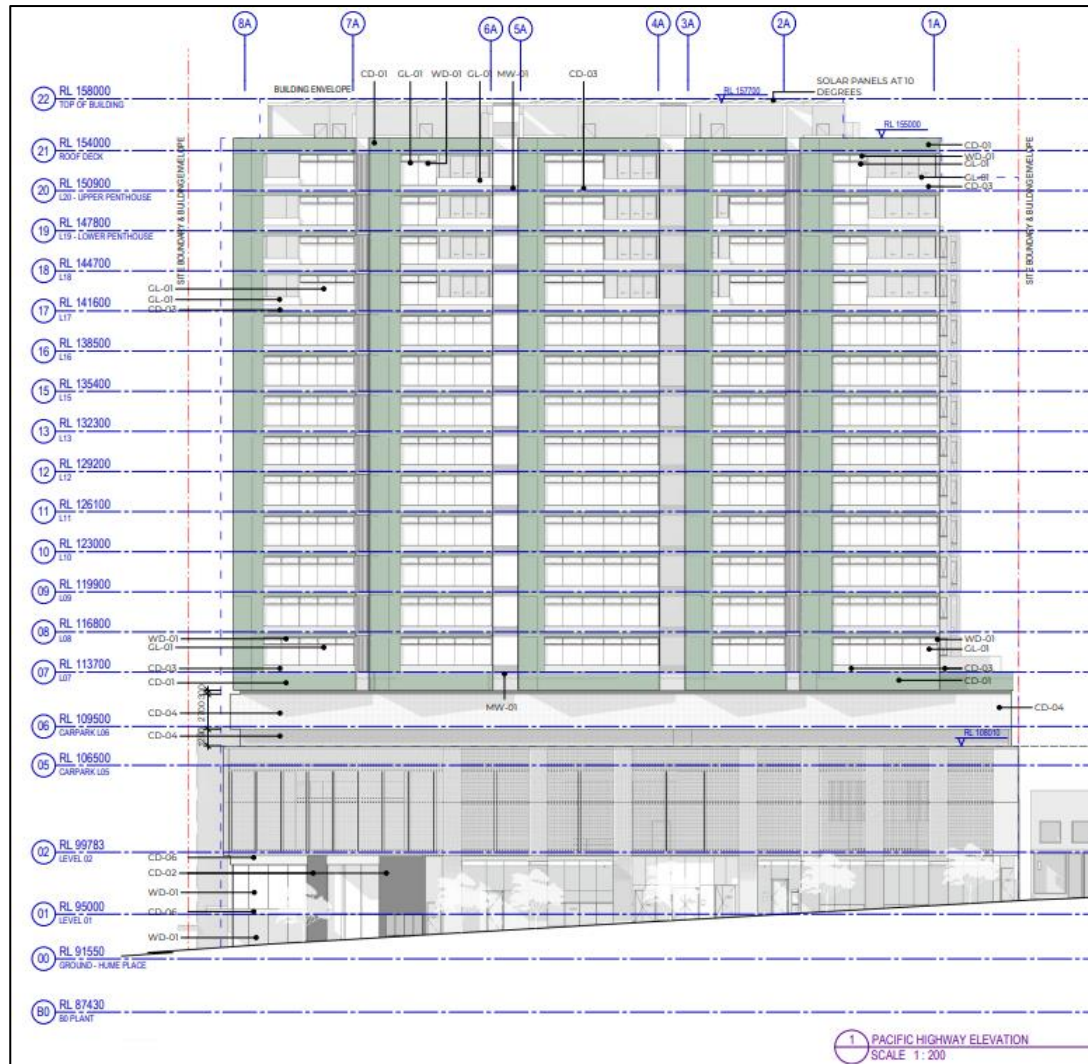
Pacific Highway Elevation (Source: Woods Bagot, 2024)
